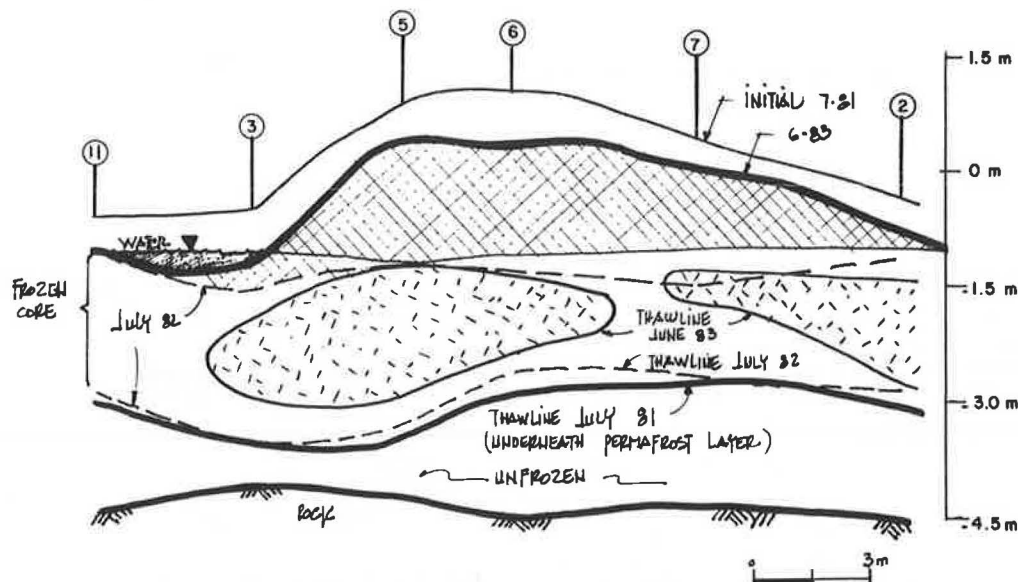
Progress of thaw line underneath test embankment (1981-1983).
